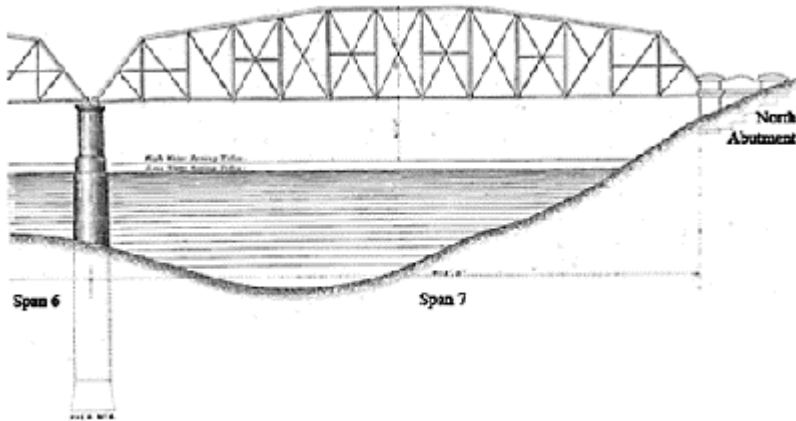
Downward slope of river bottom at Pier No. 6 which caused the pier to tilt to the right thereby increasing the length of Span No.6 from 416'-0" to 420'3" (Burge, 1890).
